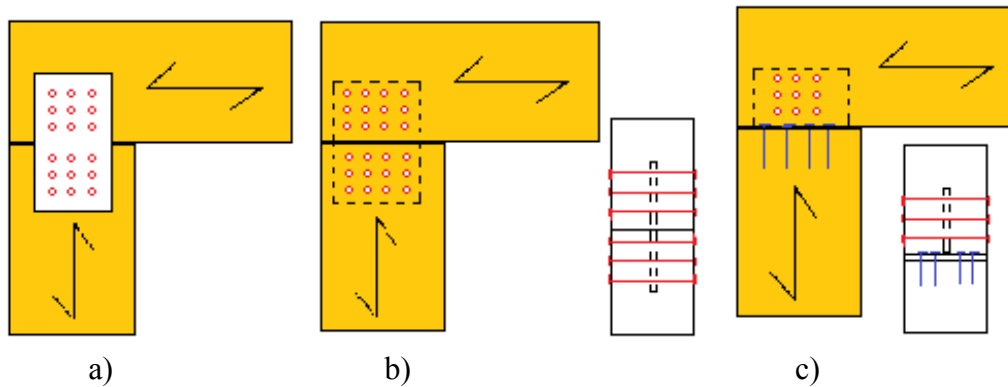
Variations of beam-to-column surface-contact joints for LVL: (a) connection with supporting wood plates or metal plates and (b-c) connections with concealed metal plates or brackets (Source: Kovanen, H. 2014)
